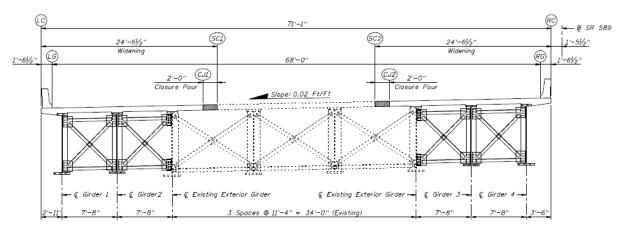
Cross-section of the bridge SR-589 over Waters Avenue
